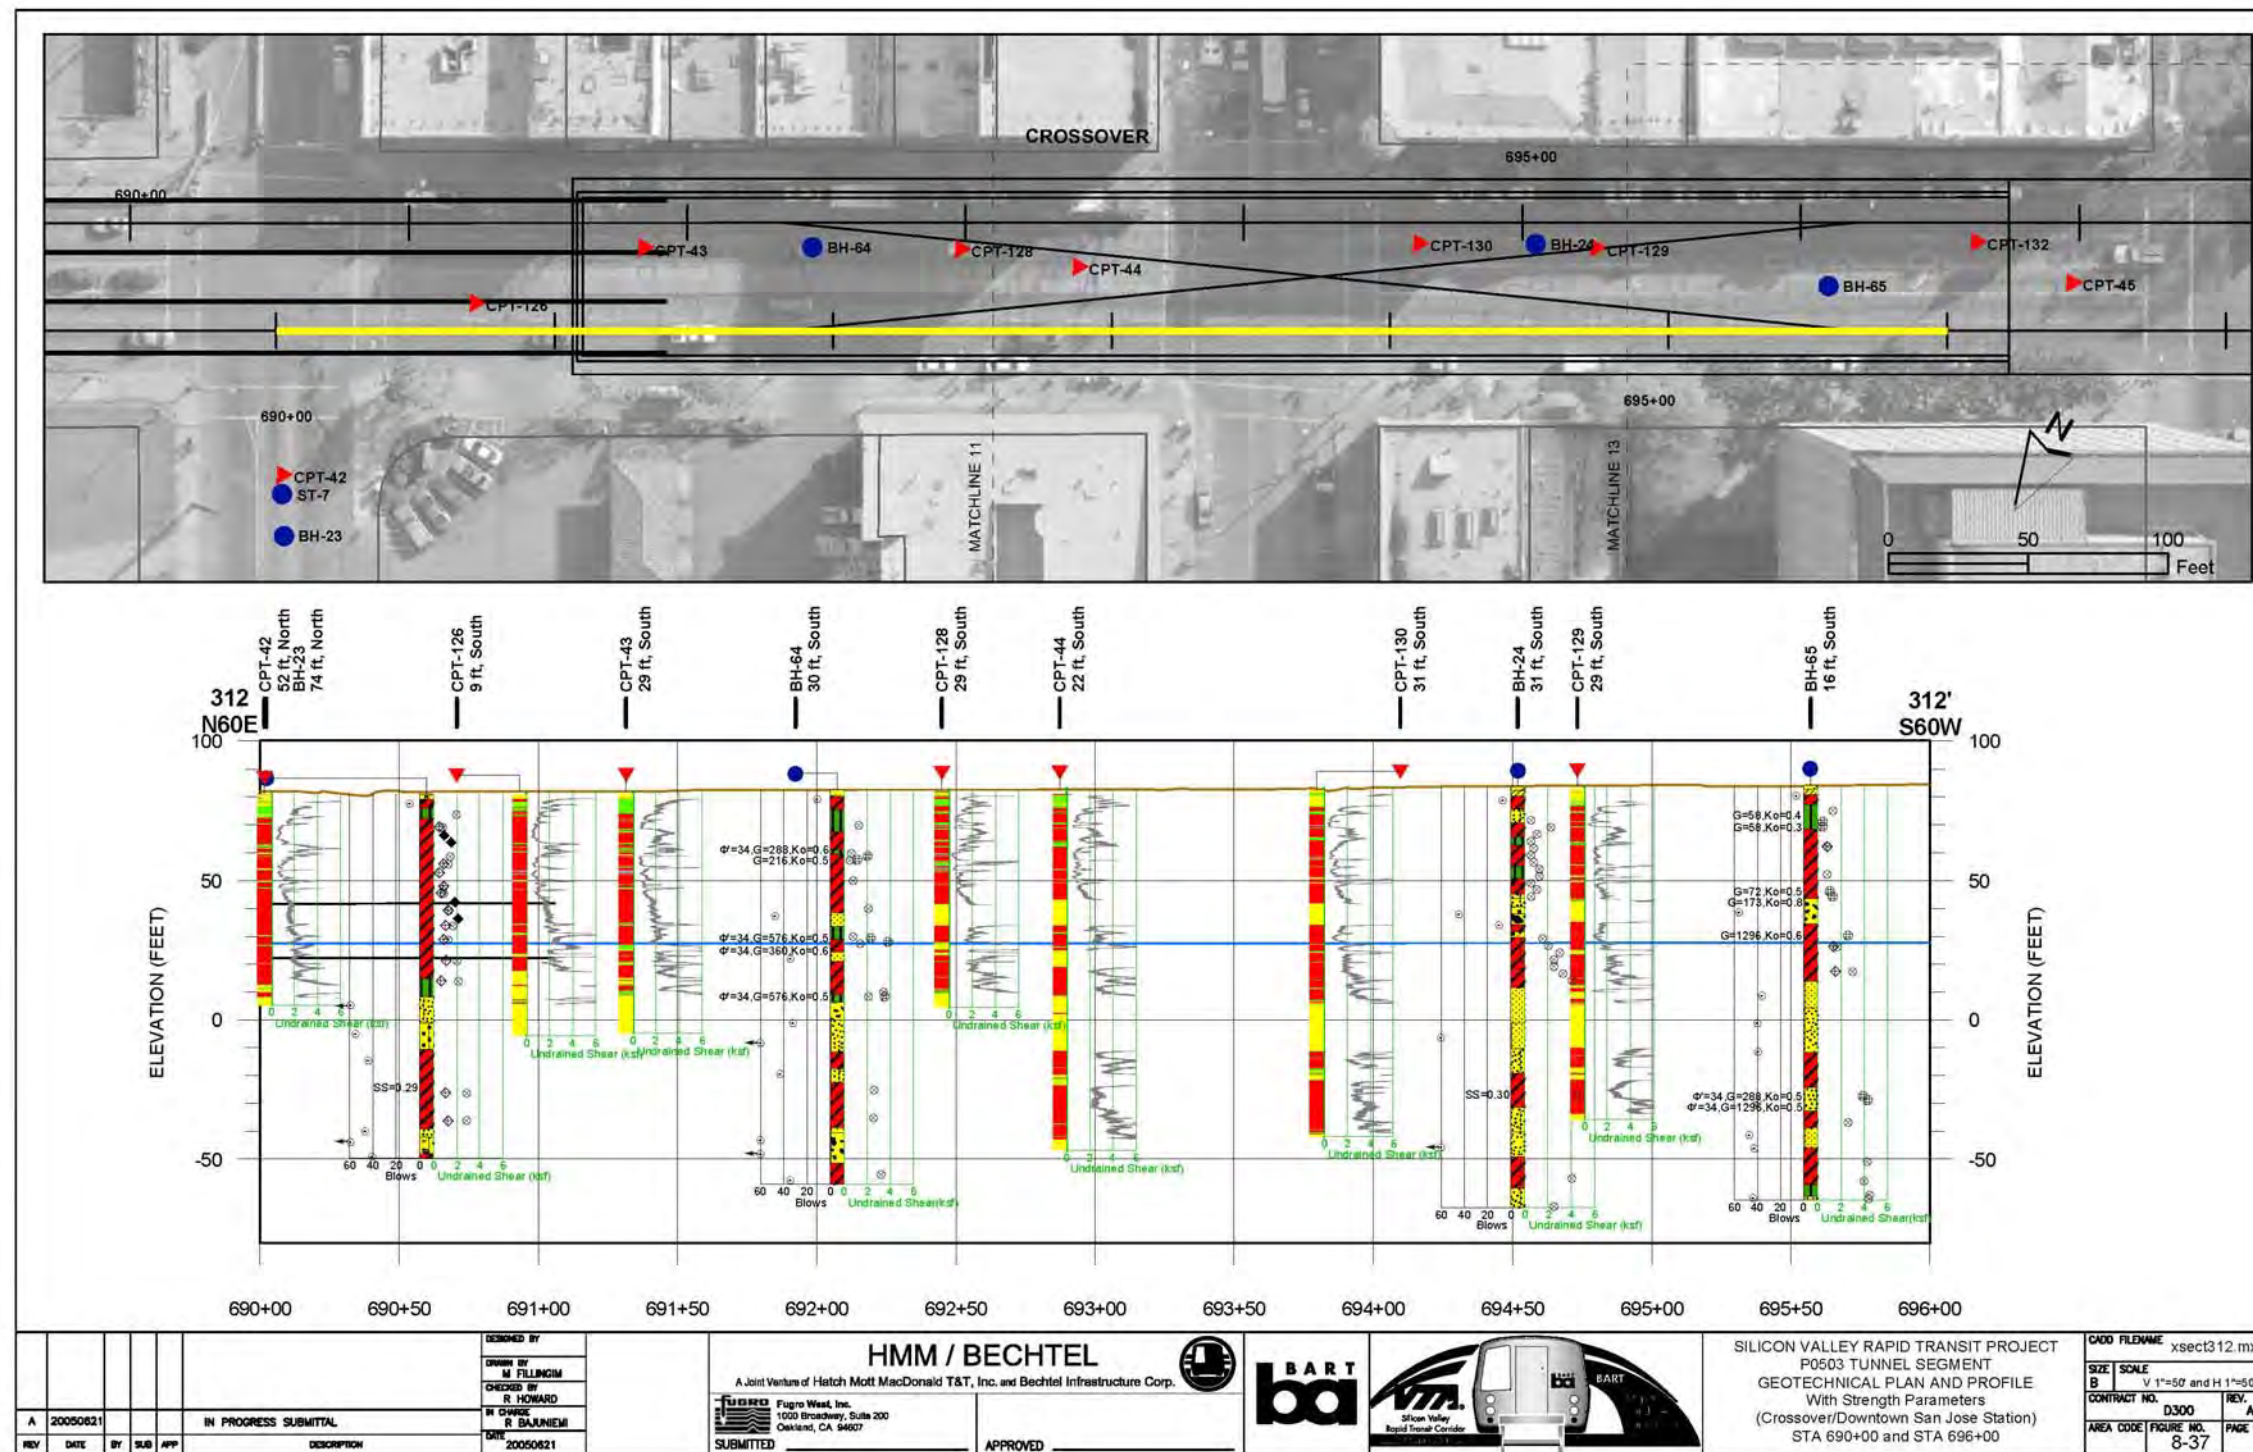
Geotechnical Plan and Profile with Strength Parameters: 690+00 to 696+00.
